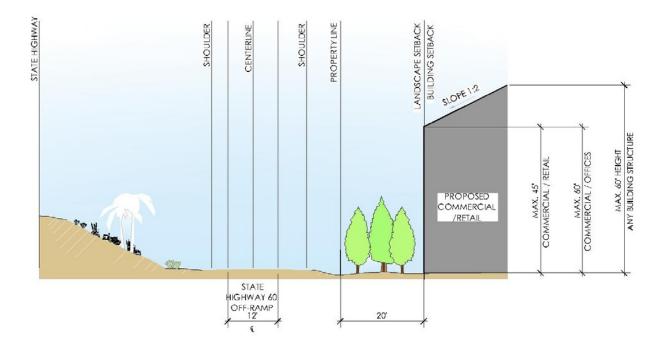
State Highway Off-ramp 60 Edge Section J
